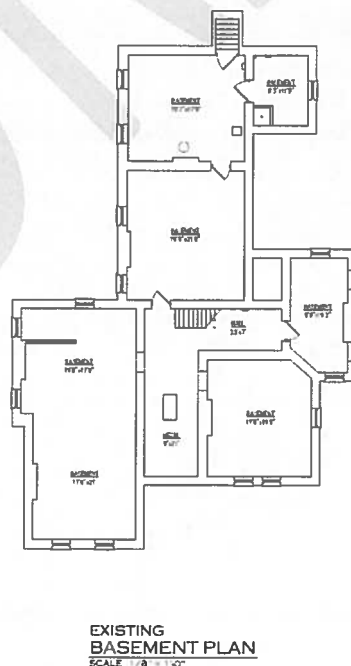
Basement Floor Plan, drawn by Stewart Architects, PLLC, 2018.
